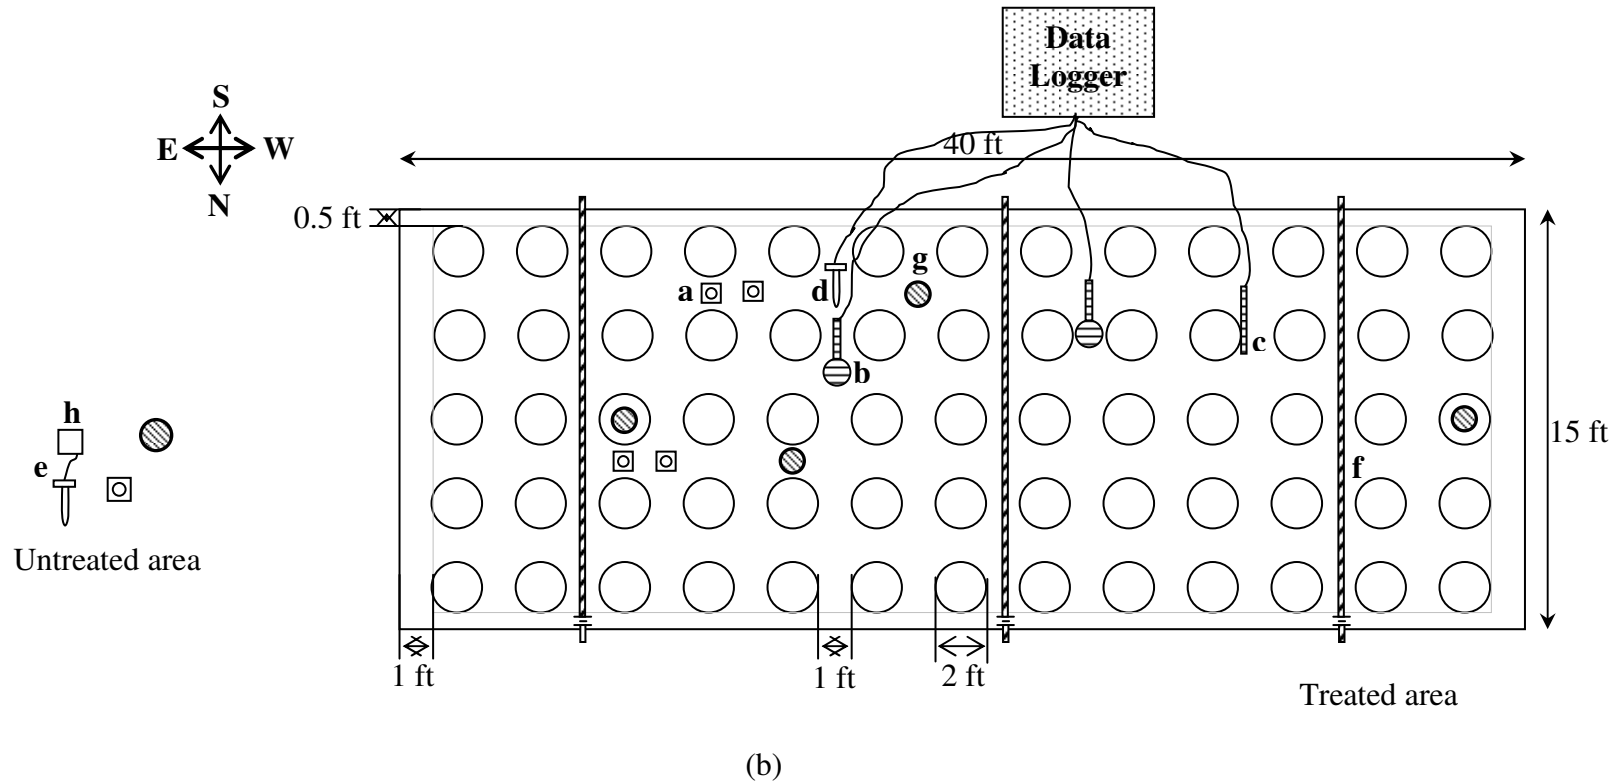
Plan view of showing instrumentation at both treated and untreated areas of site 2 ($a_r = 35\%$)
